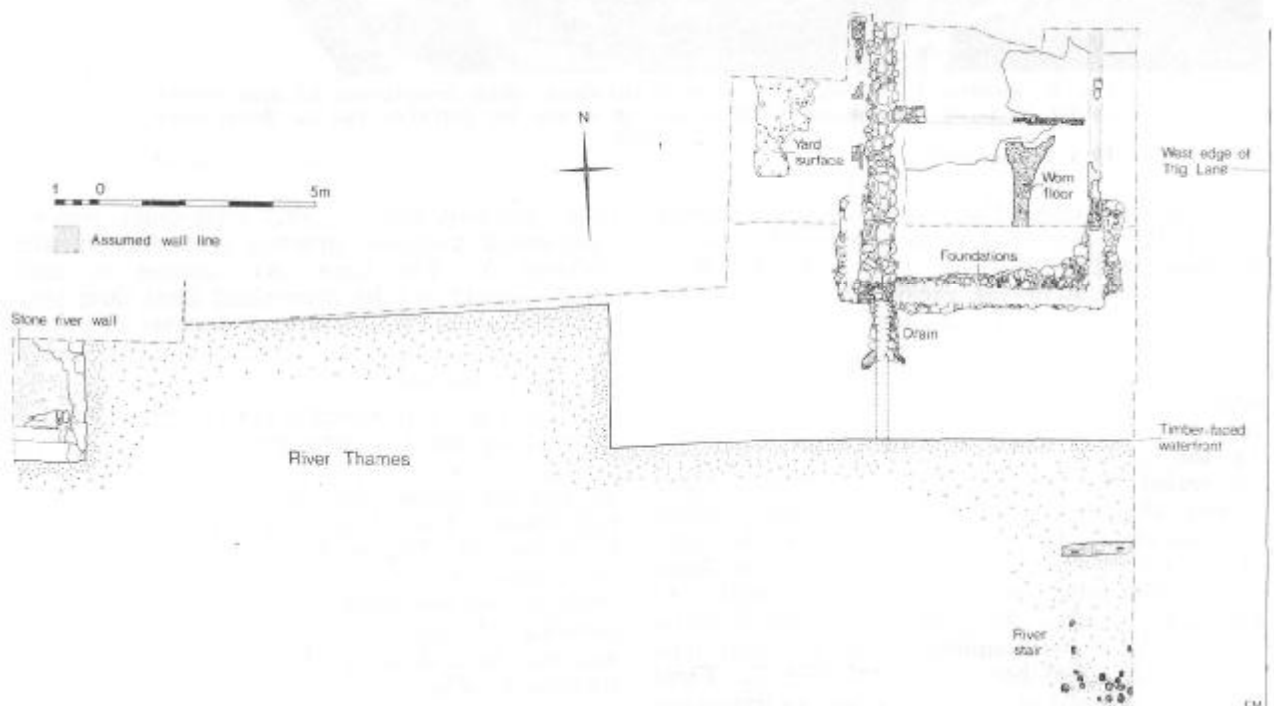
Plan of Trig Lane waterfront in c. 1350 showing position of Building C, cf. Fig. 6.
